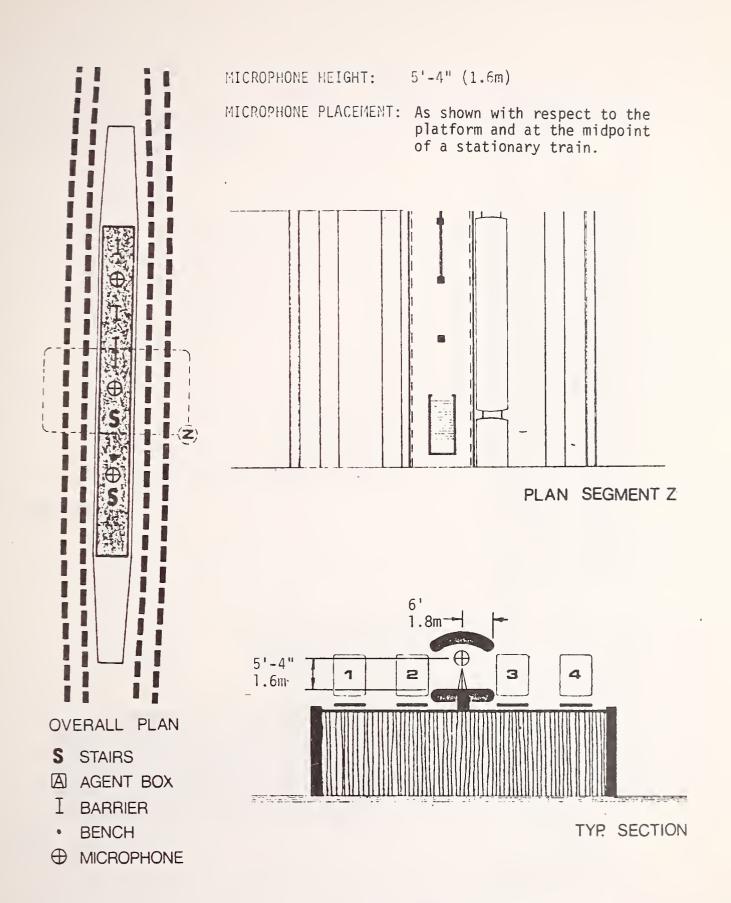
Center Platform Elevated Embankment Station Configuration (Station Type 4)
